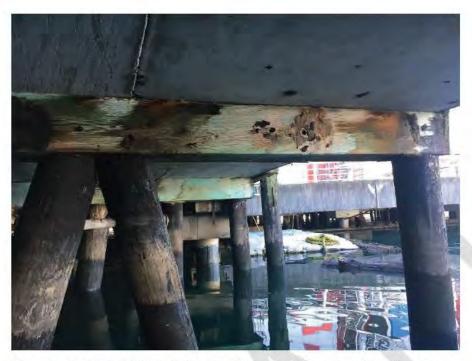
Impressed current system installed on steel pipe piles at the City heavy deck to the southeast of Science World
